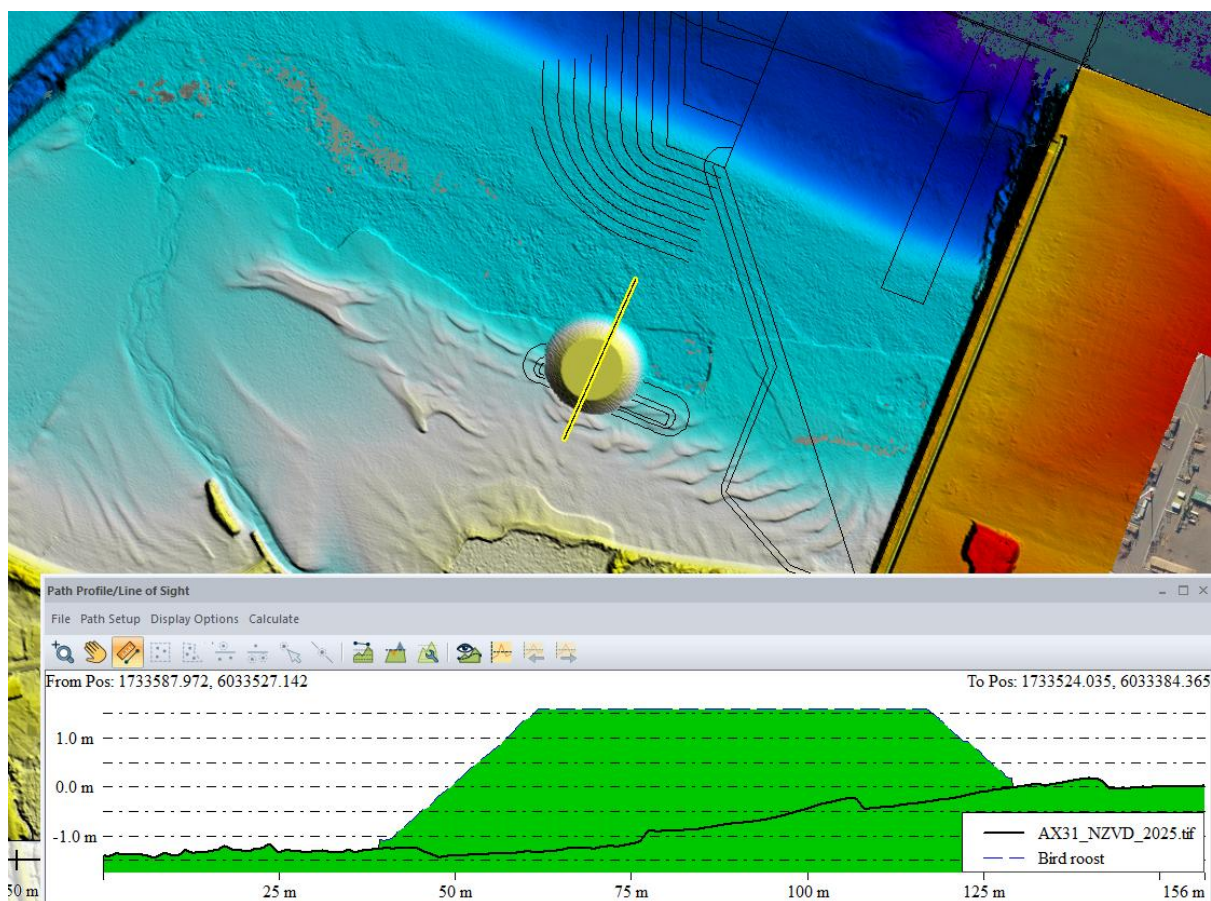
Alternative bird roost configuration (plan view and section)) to accommodate avifauna and ecological requirements. Note the outline of the Northport consented bird roost location is also shown on the plan.
